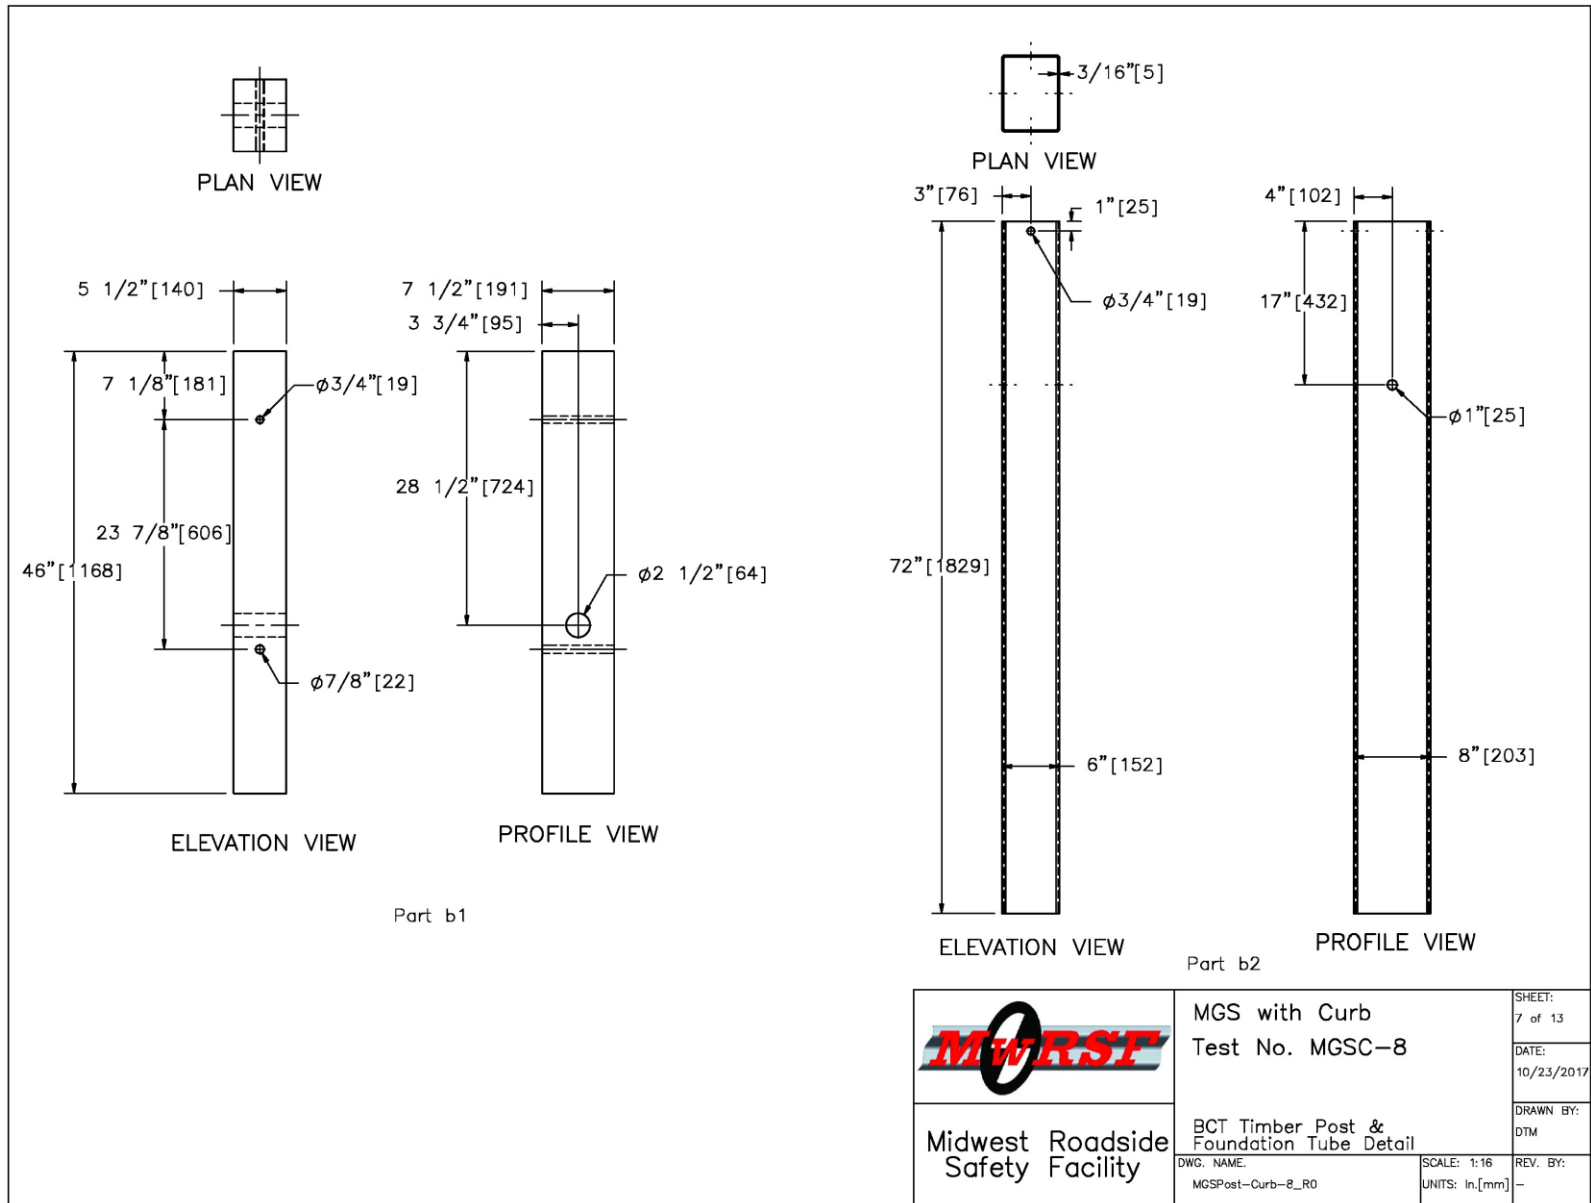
BCT Timber Post and Foundation Tube Detail, Test No. MGSC-8
